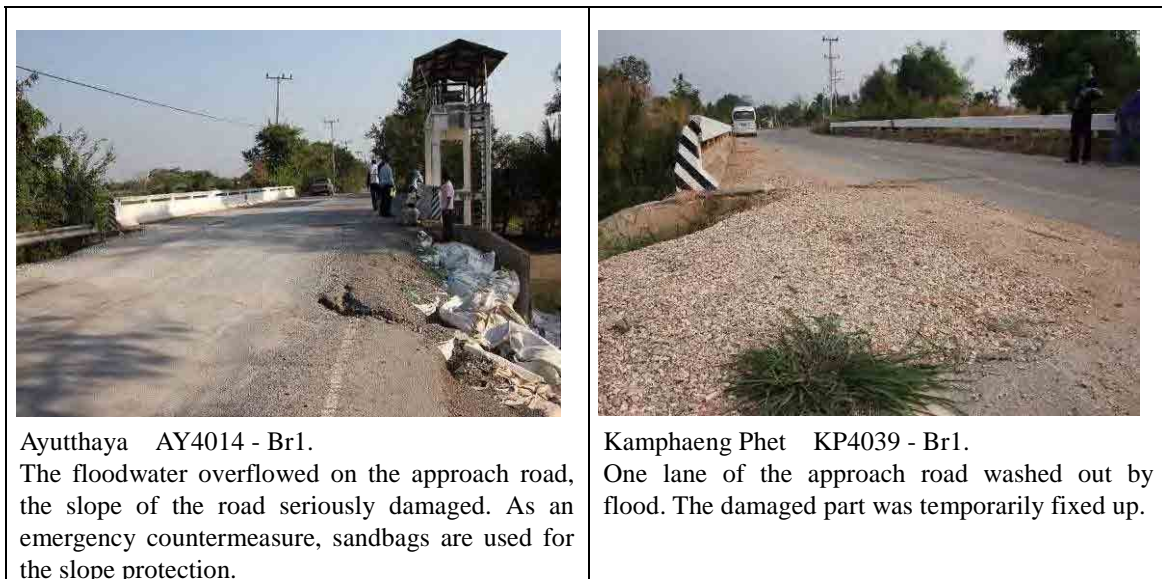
Collapse of slope & washout of approach road caused by inundation & overflowing
